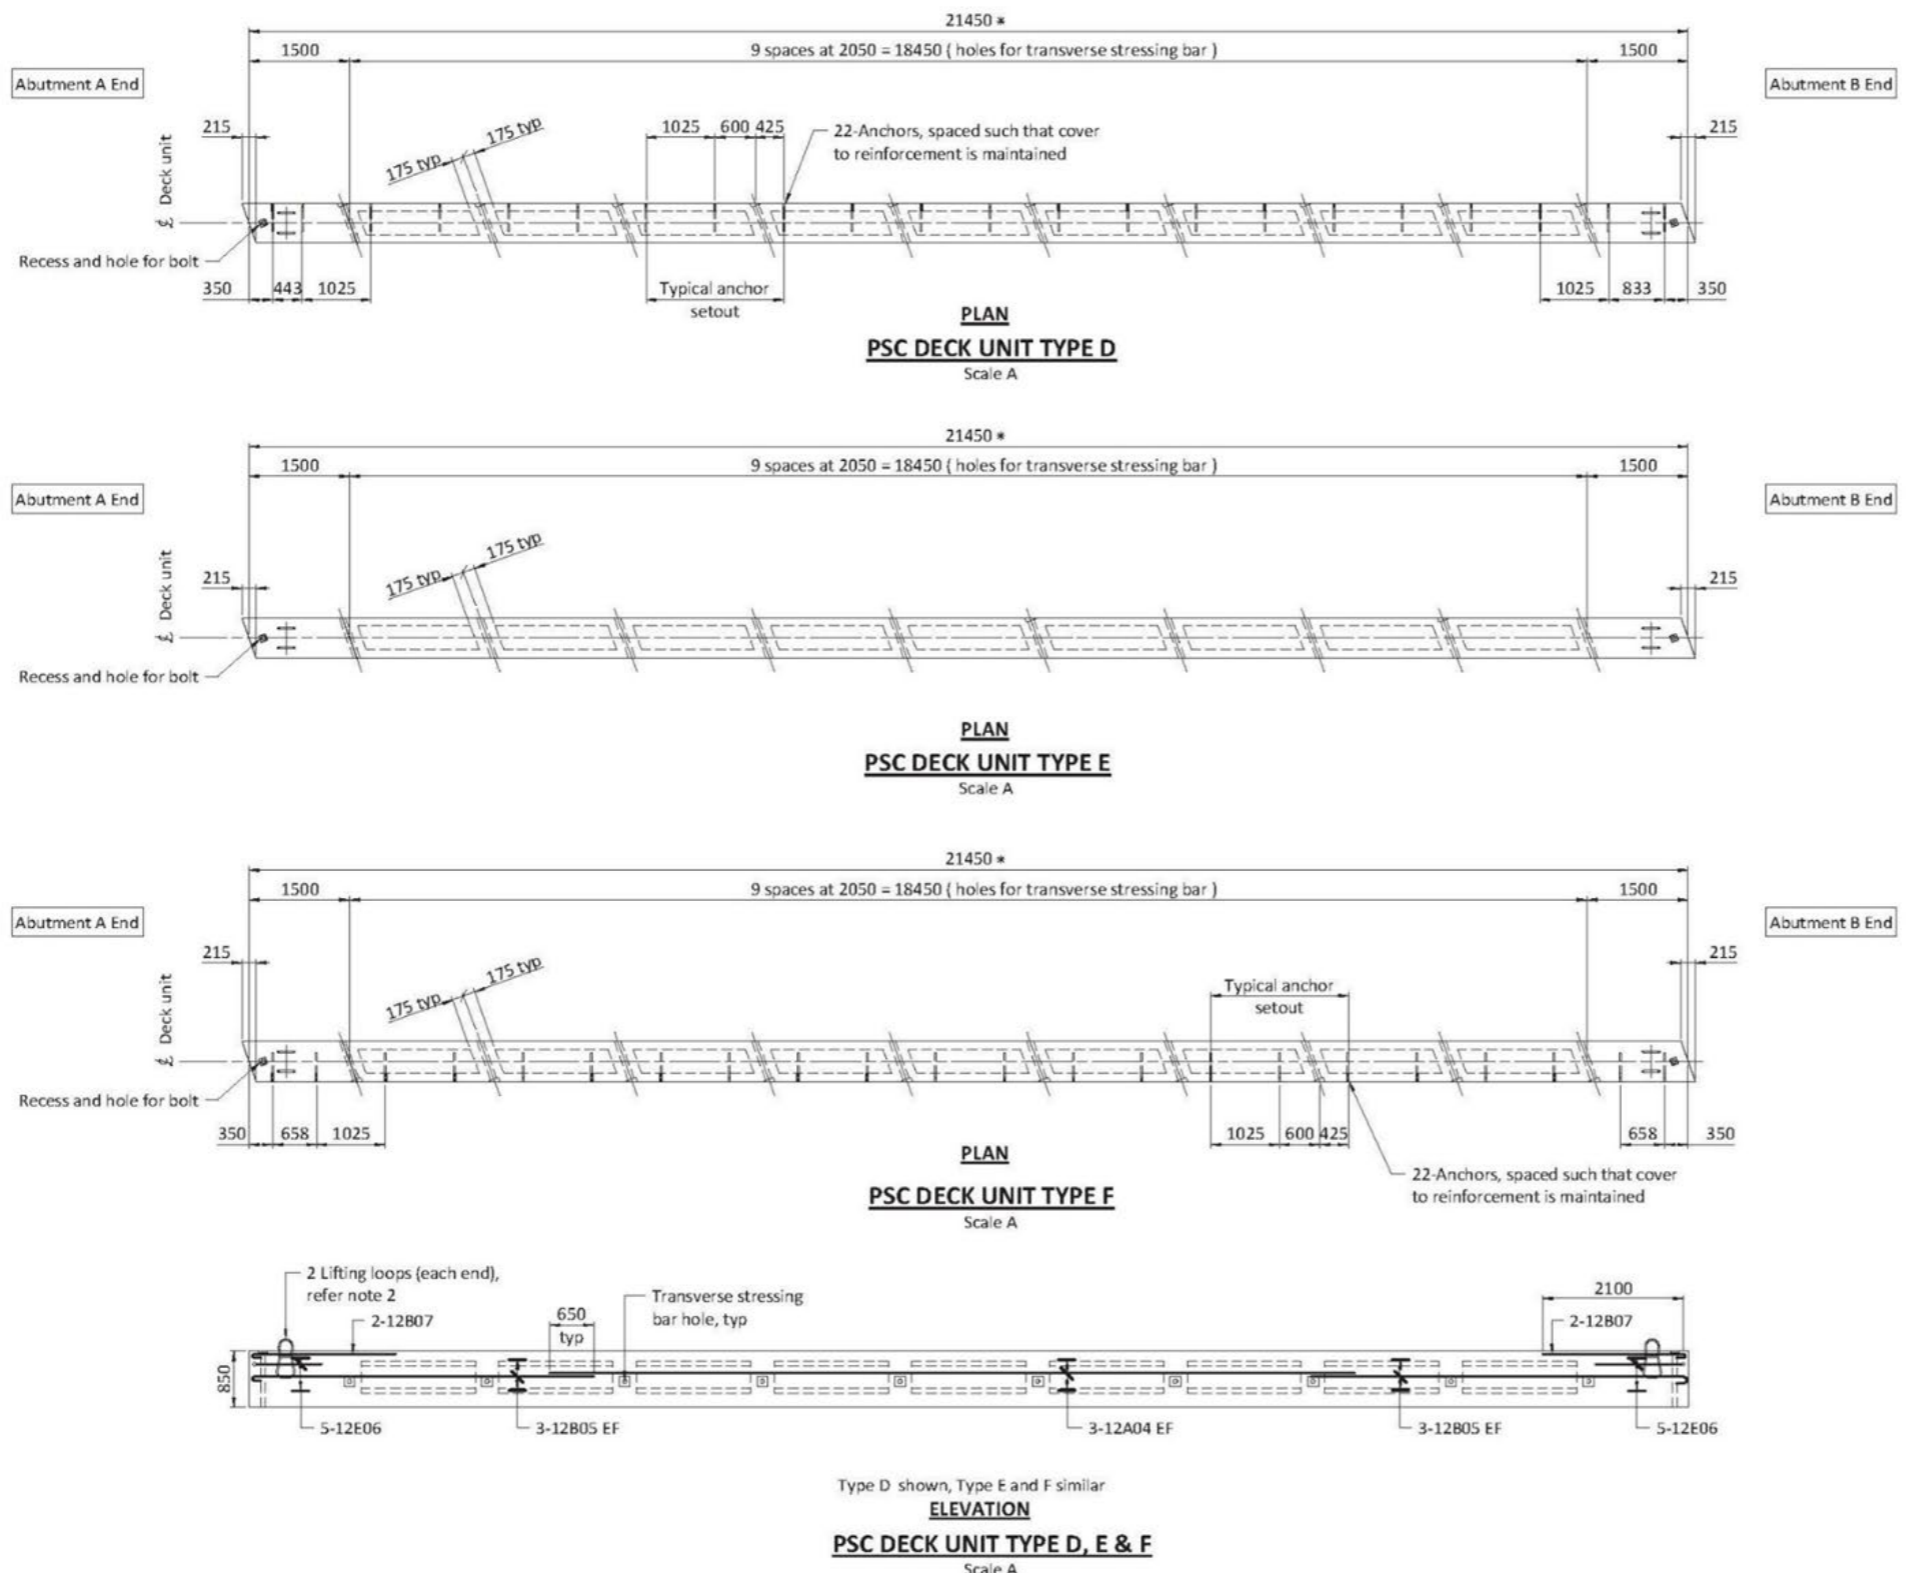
(d) - Example transversely stressed deck unit bridge drawings - Sheet 4
